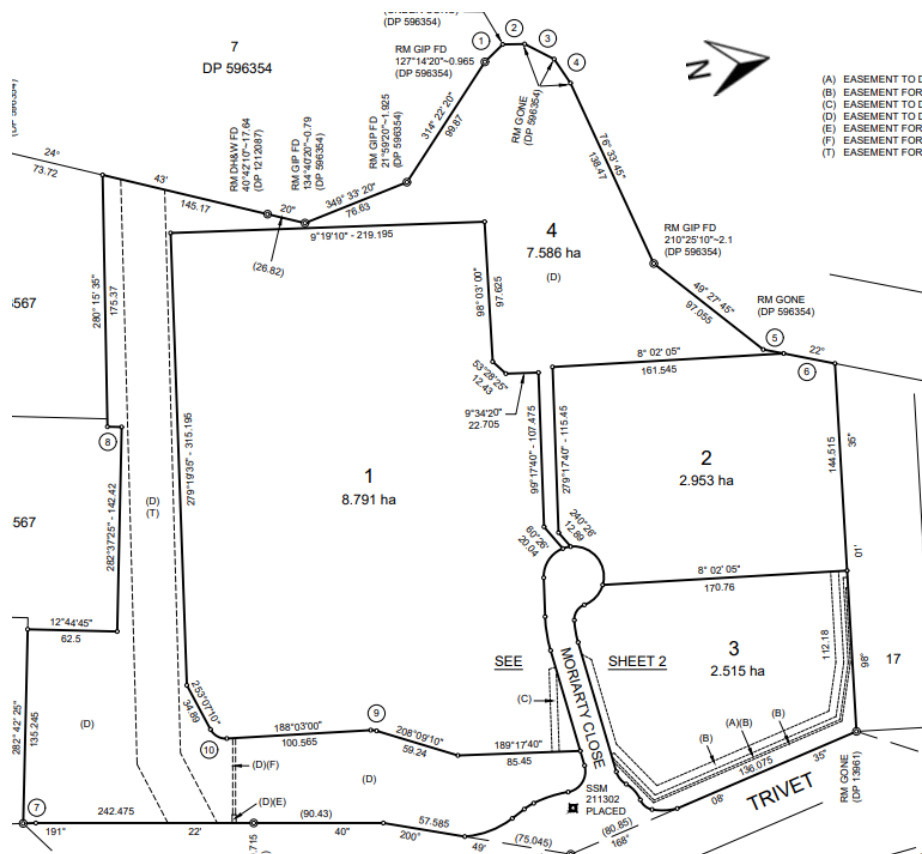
| SSD-7664-Mod-3 –Proposed Development Site Layout Plan
